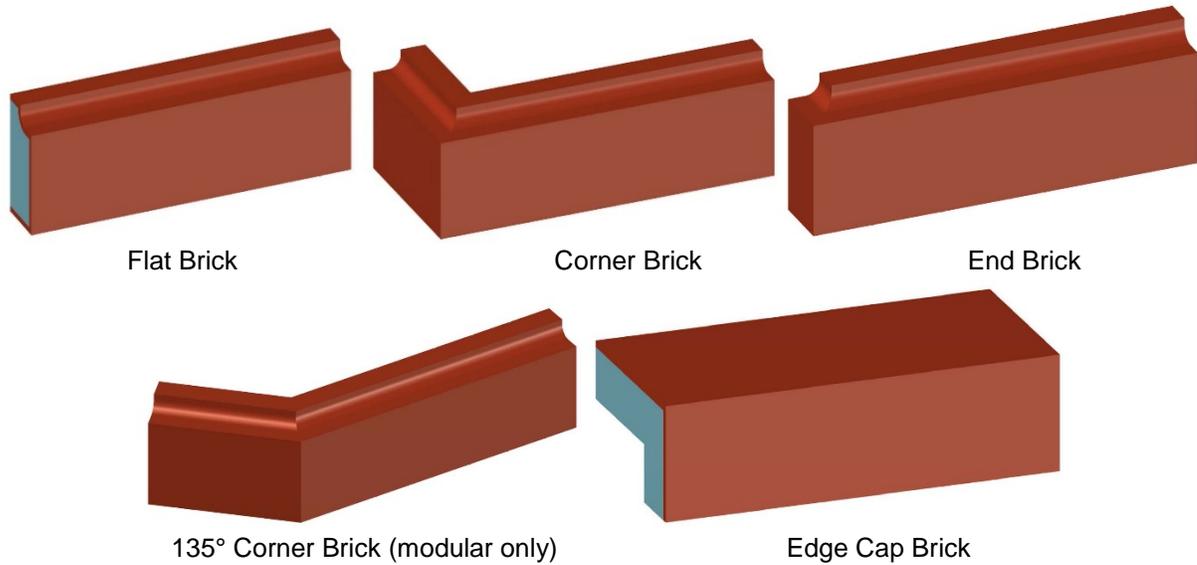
Flat Brick, Corner Brick, End Brick; 135° Corner Brick, and Edge Cap Brick Configurations
